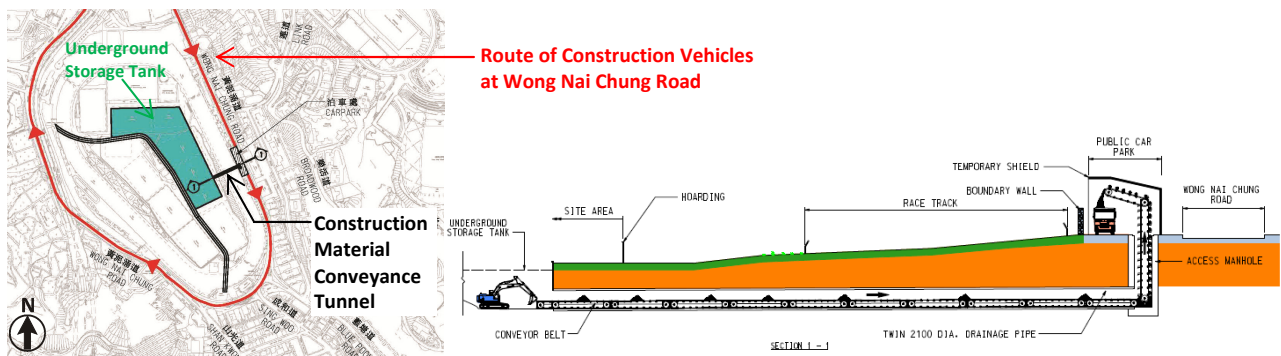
Plan View and Section of New Construction Material Conveyance Tunnel
